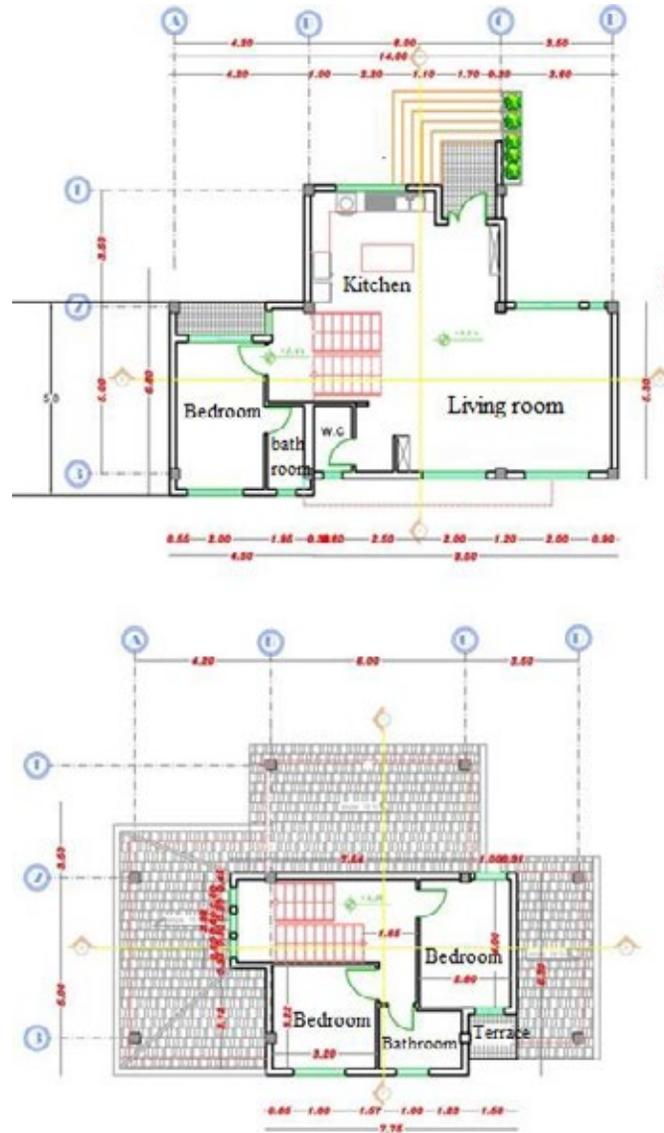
Plan of the first and the second floors of the building in the base conditions
